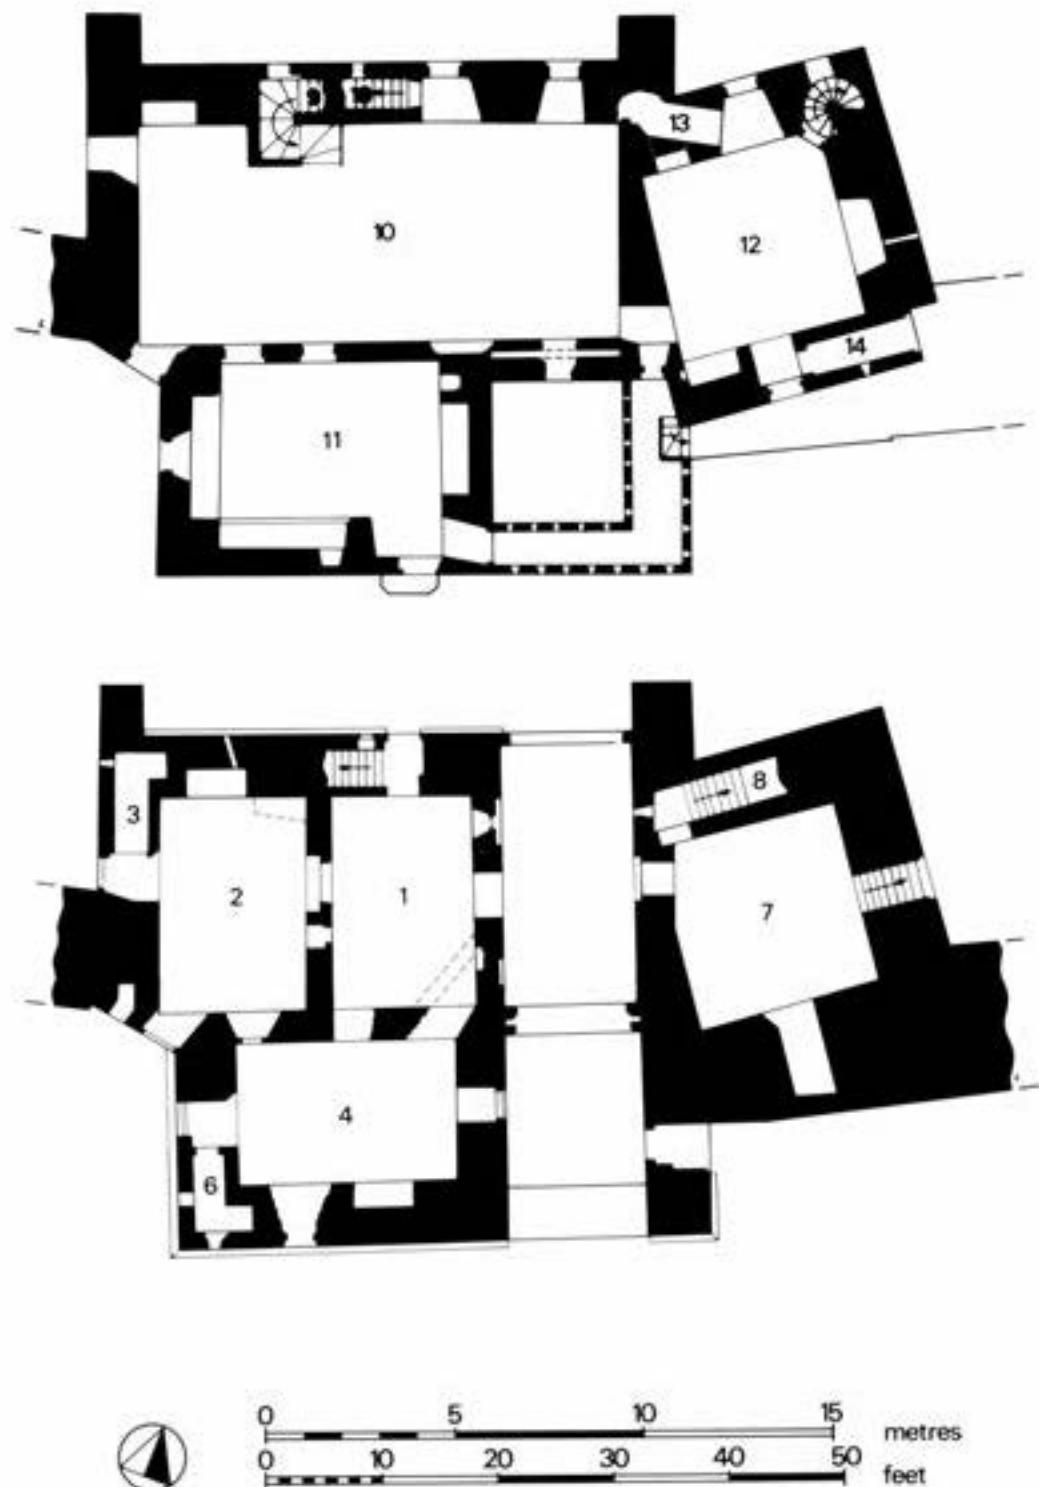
The outer gatehouse, plans at ground (below) and first floor (above)
